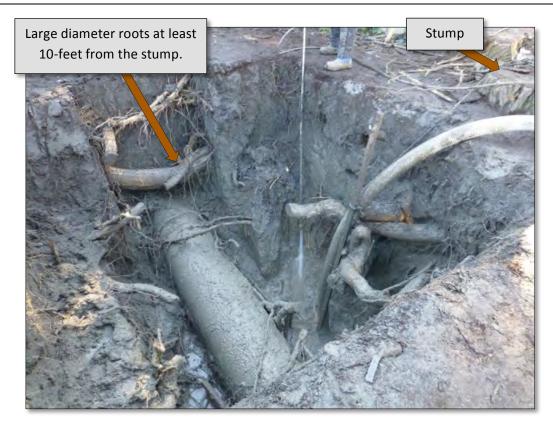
Dig site RWVC-51-13 (RWVIM-104-13)
